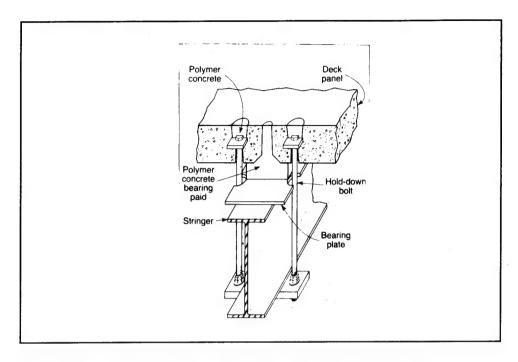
Bearing assembly, Woodrow Wilson Memorial Bridge (from ASCE 1984)
